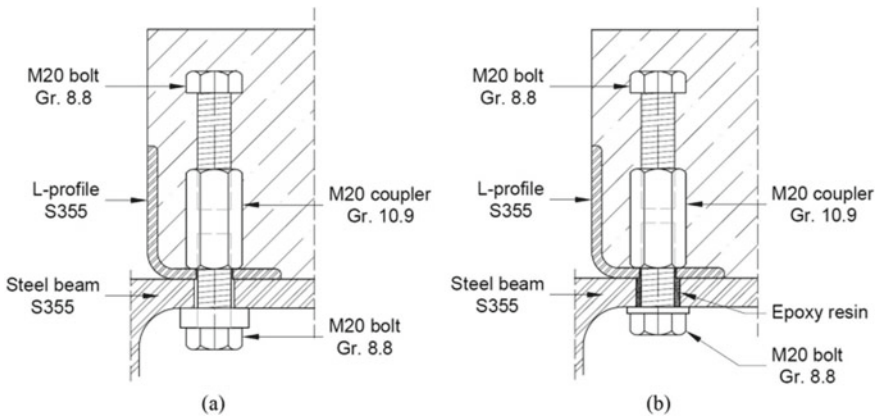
Coupler system with a pre-tensioned bolts and b epoxy resin [16]
